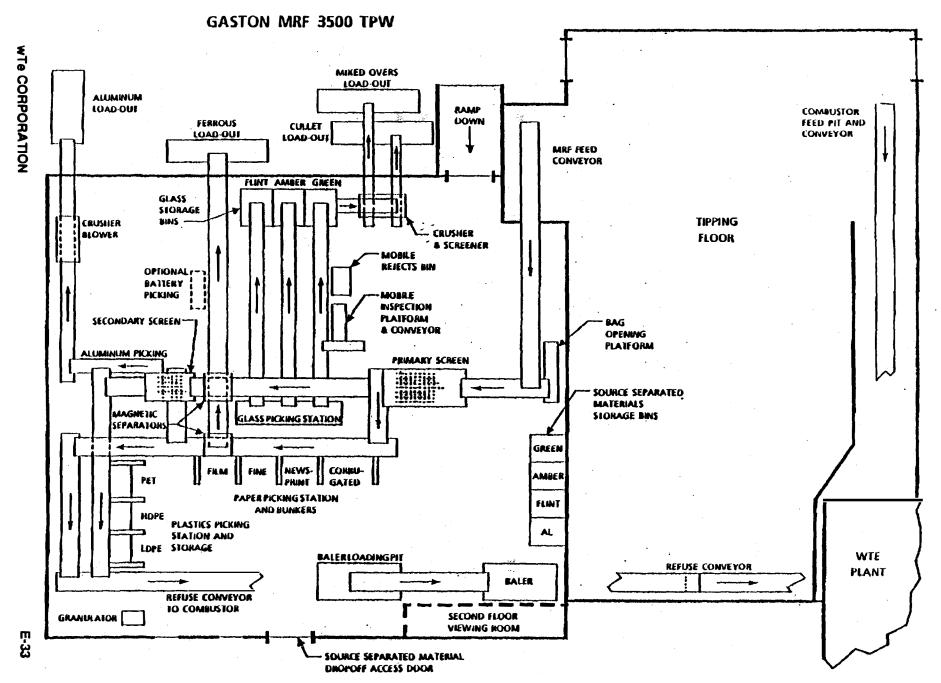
Floor Plan for Proposed Gaston County, North Carolina, Mixed Waste MRF
